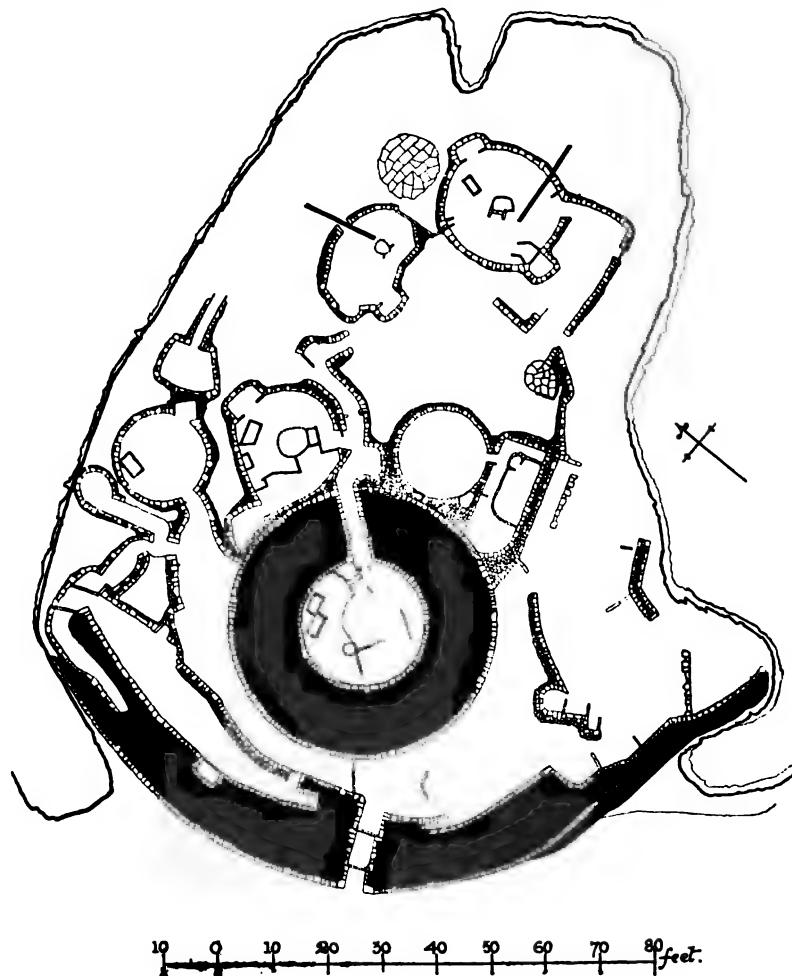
Ground Plan of Nybster Broch, with its forework and outbuildings.
